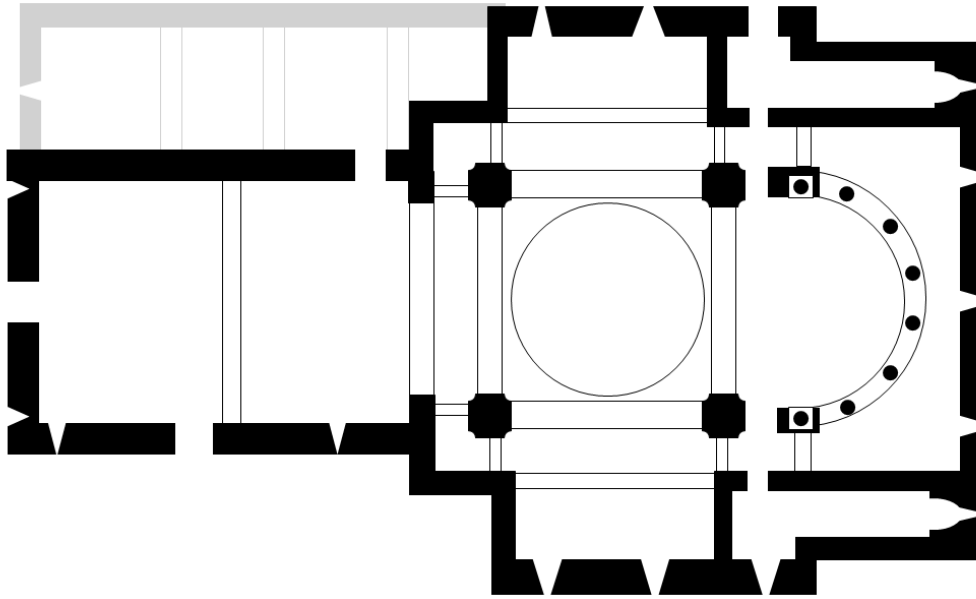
Simplified floor plan of Ishkhani cathedral. The rich articulation of its walls through pilaster strips and engaged half columns is omitted.
